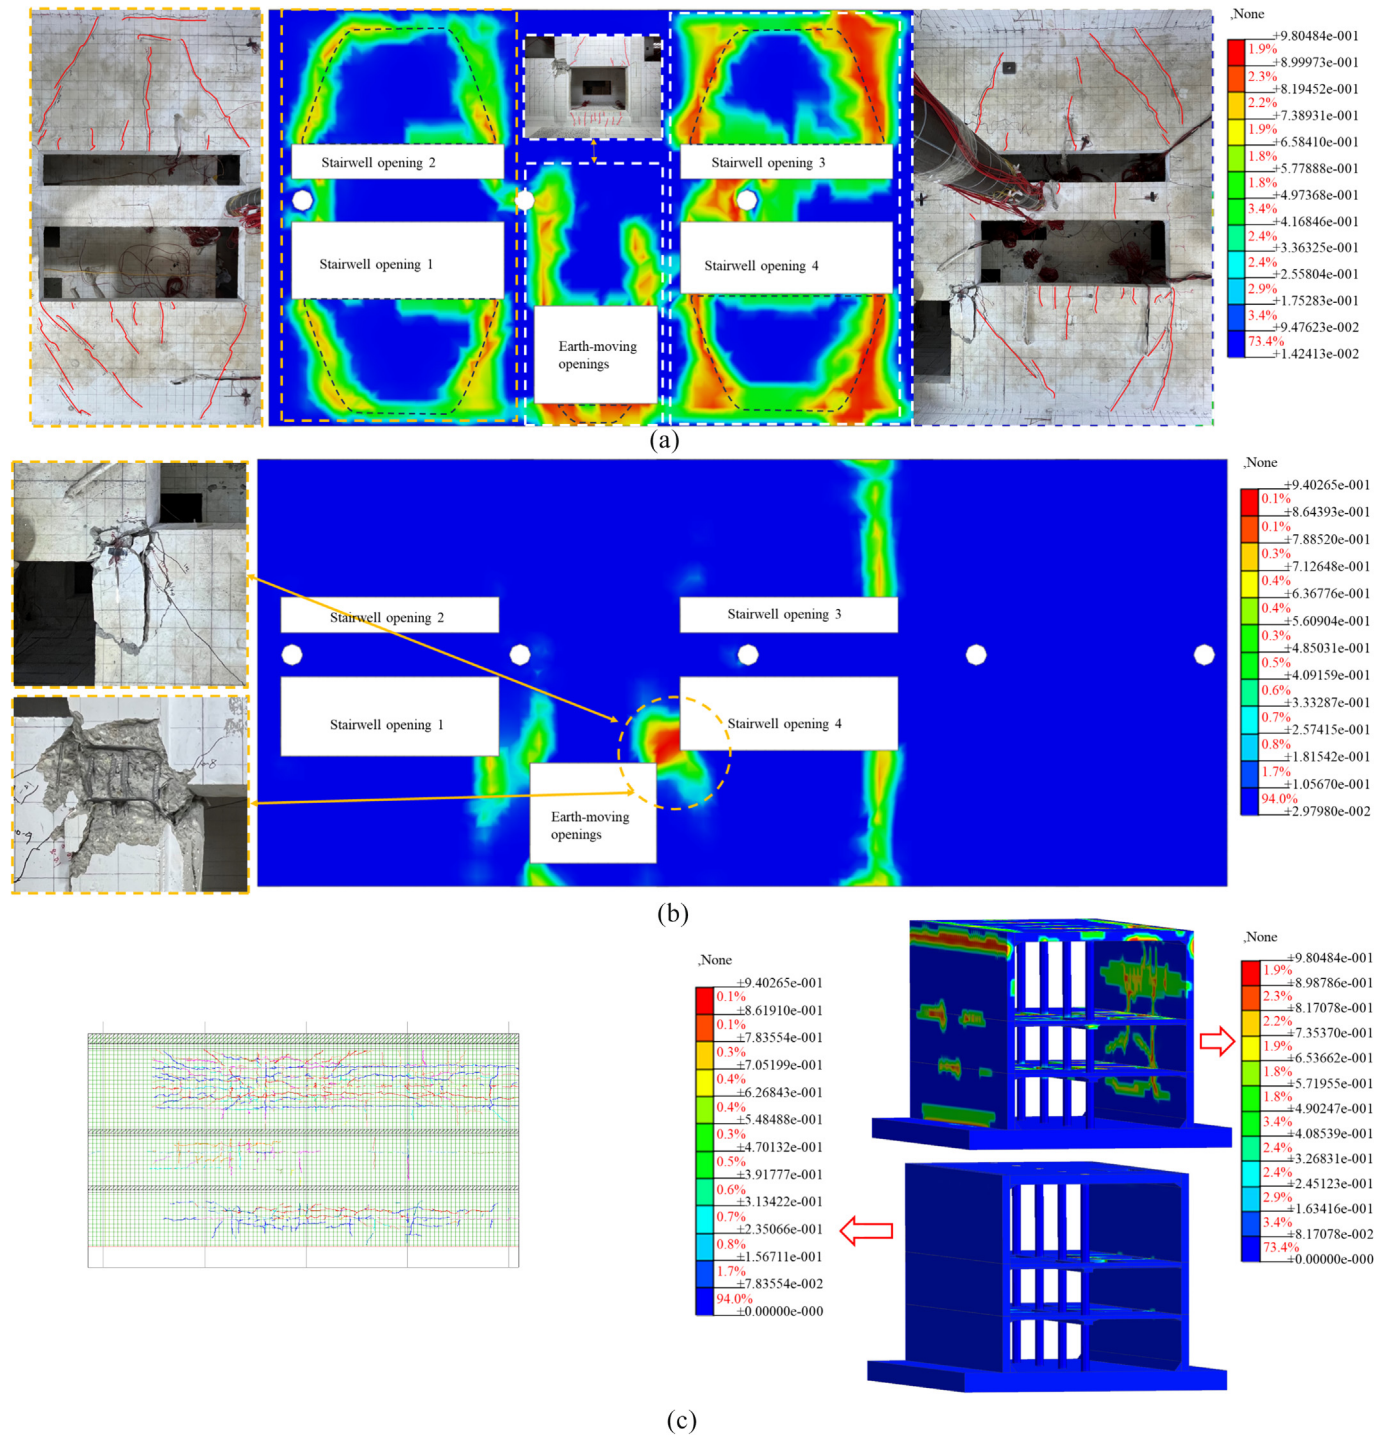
Crack development (Stage IV). (a) Cracking and damage status of the basement second-floor slab, (b) cracking and damage status of the basement third-floor slab, and (c) side wall cracking and damage status.
